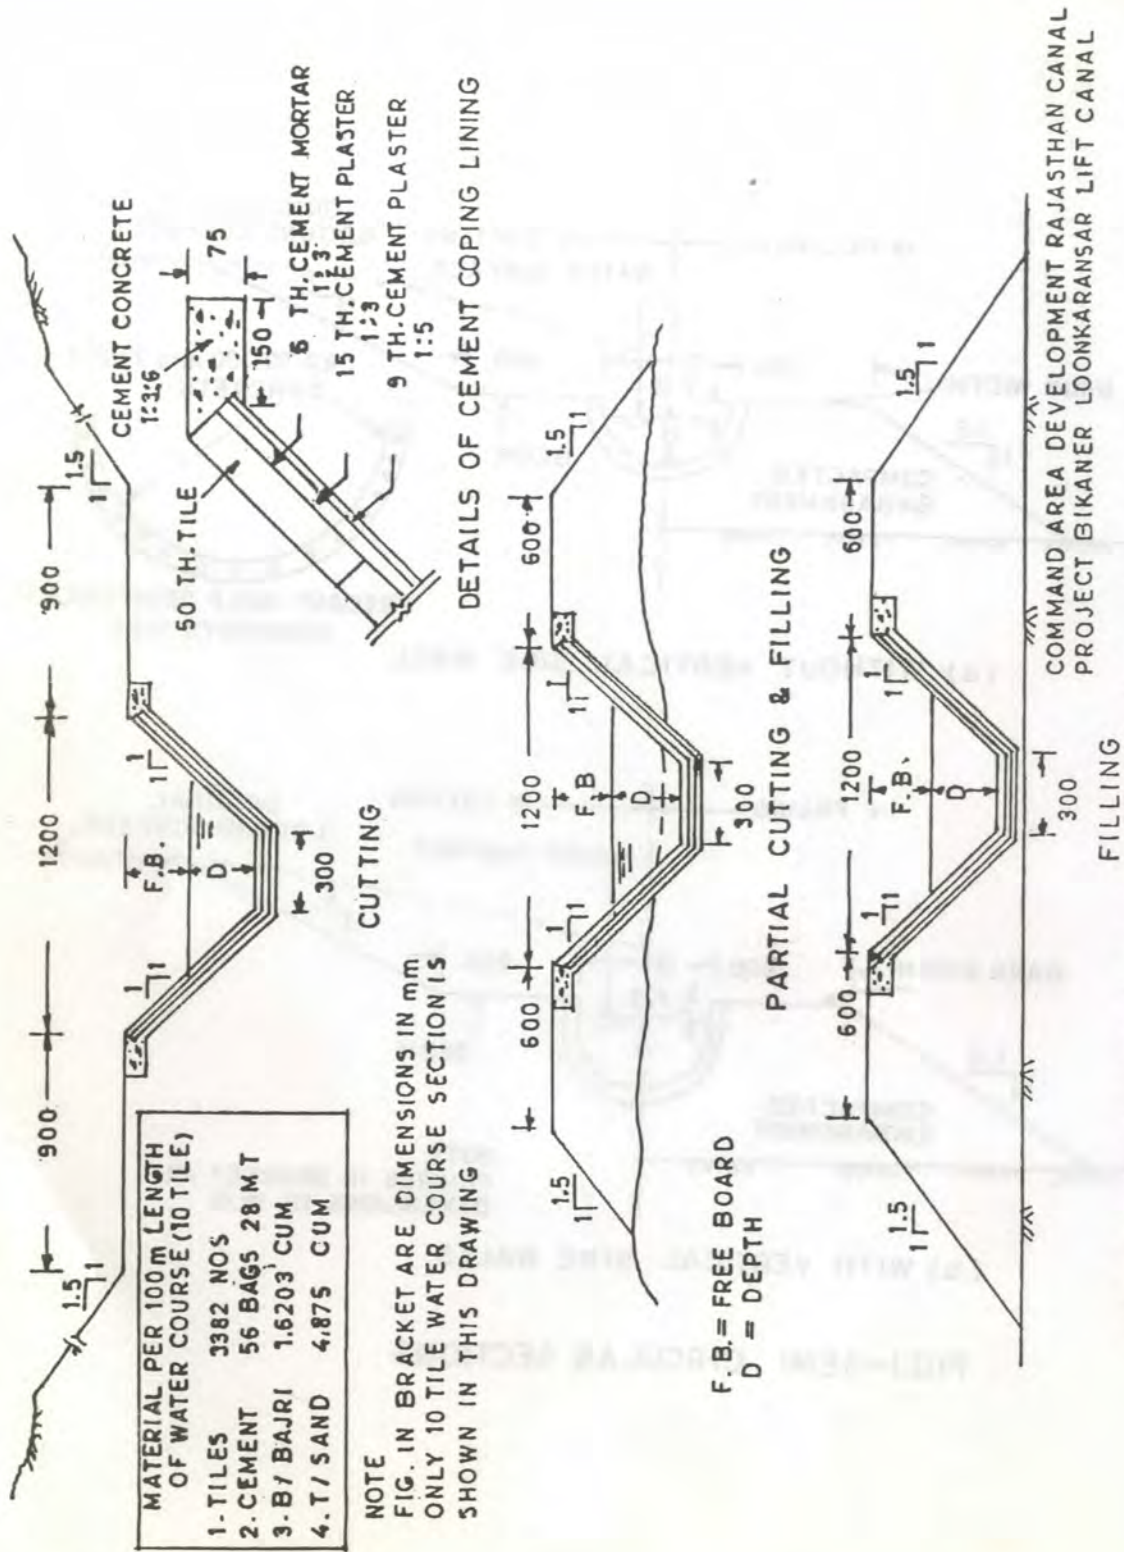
TYPICAL CROSS SECTION OF LINED WATER-COURSES
